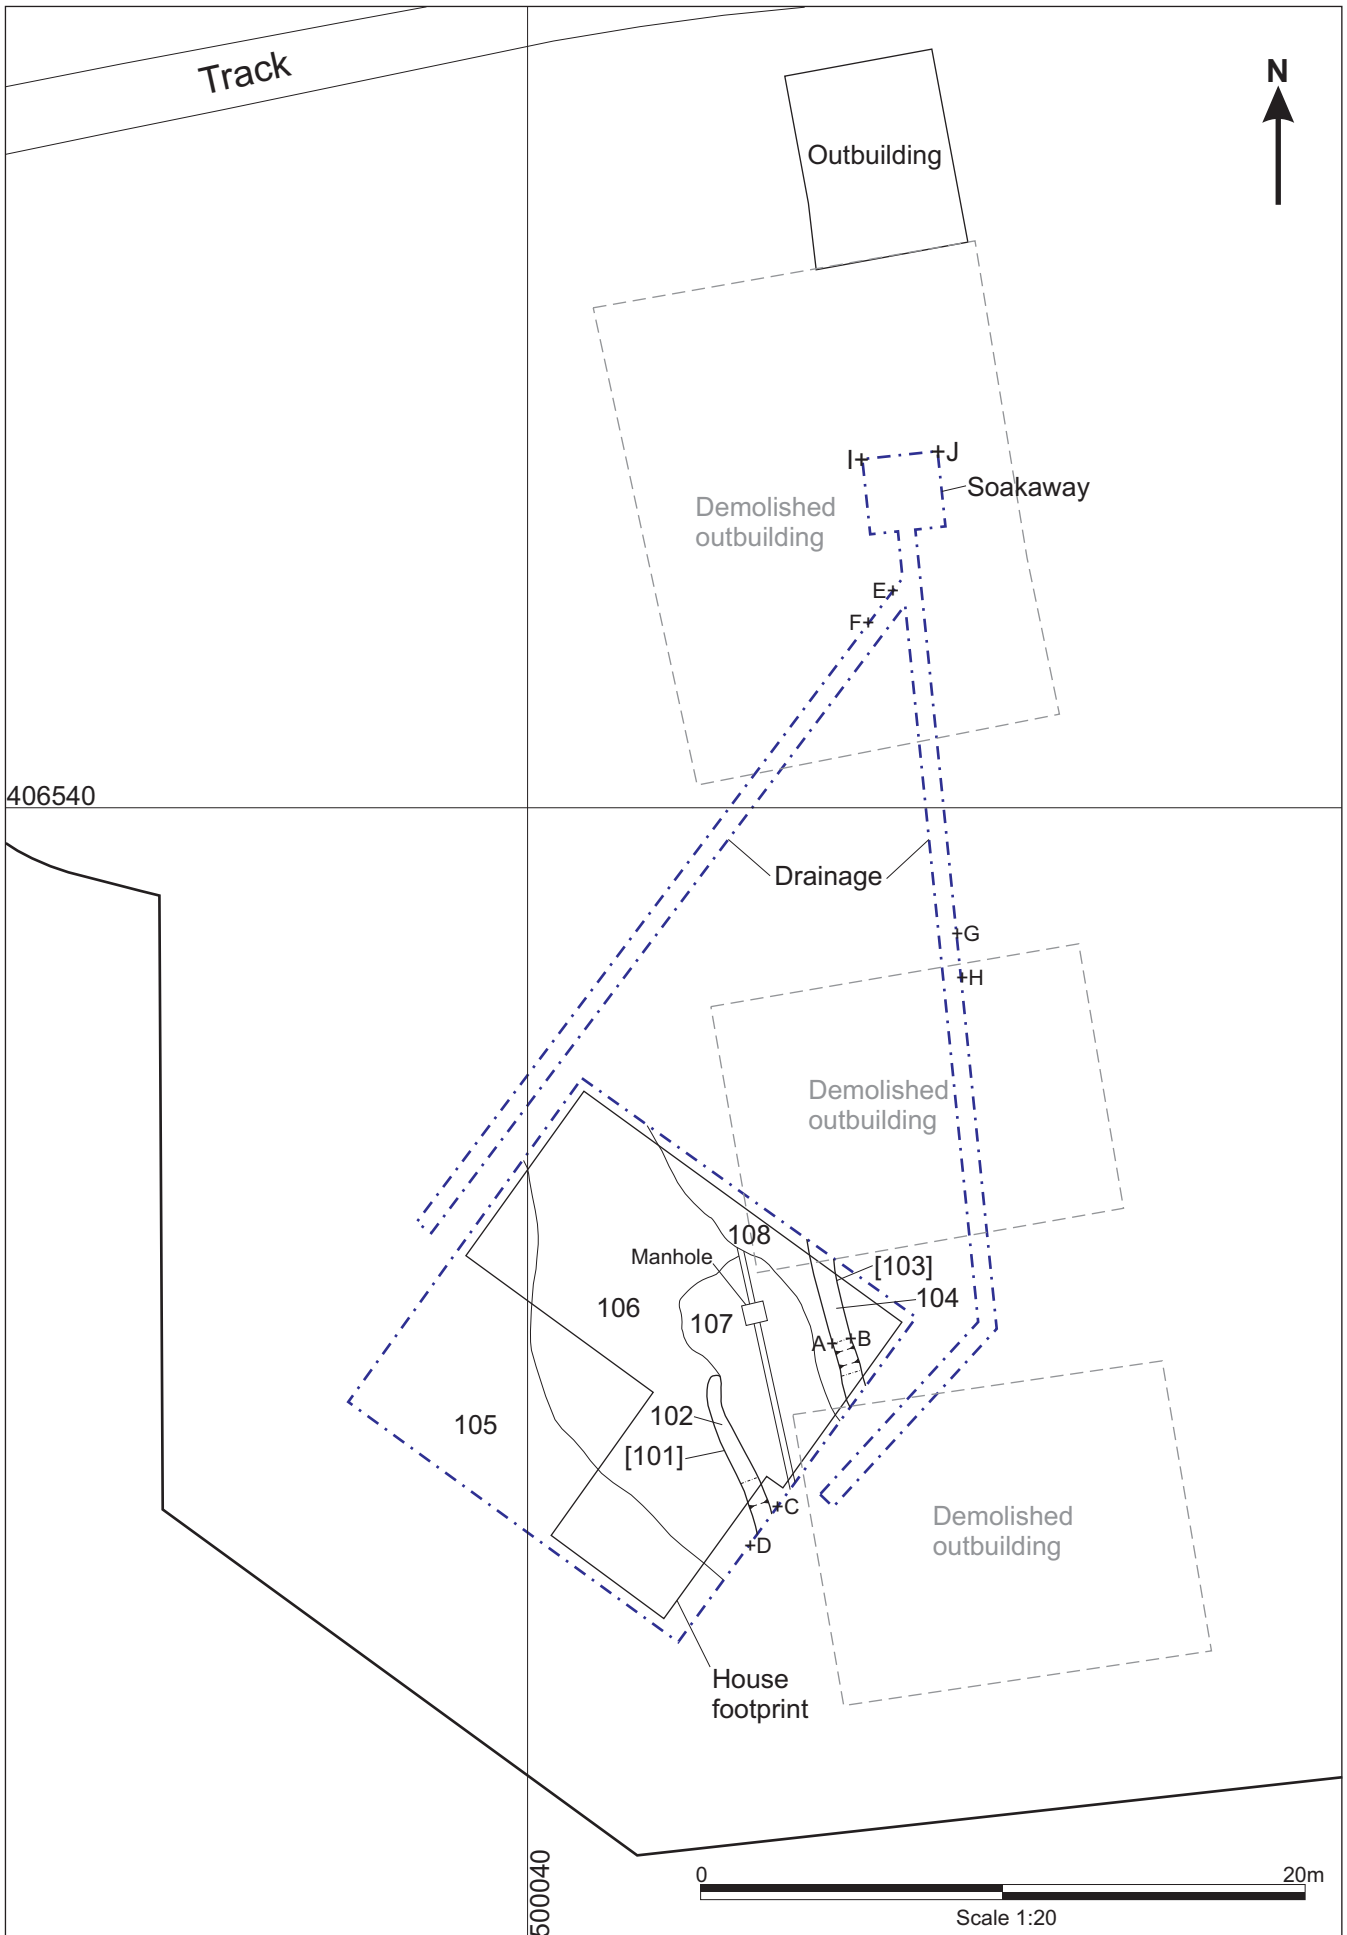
Site plan at scale 1:250, with area of groundworks shown in blue. Sections shown on Figure 4
